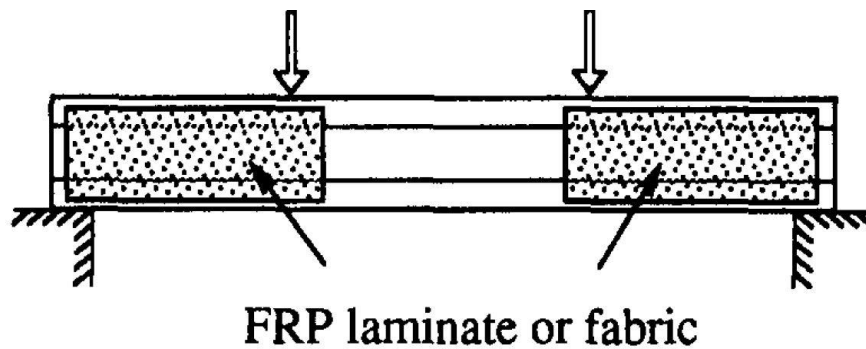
Demonstration of CFRP fabrics used as shear reinforcement (Triantafillou, 1997).
